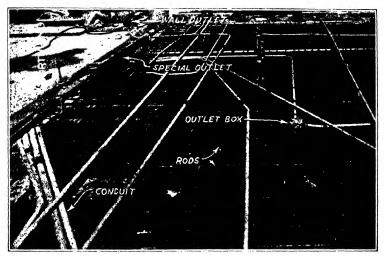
Installation of Thin-Wall Tubing and Outlet Boxes before a Concrete
